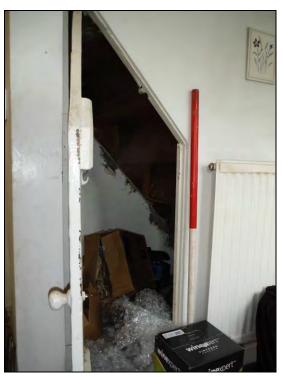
Understairs cupboard at the northern extent of Room G3 (scale = 1 x 1m).
